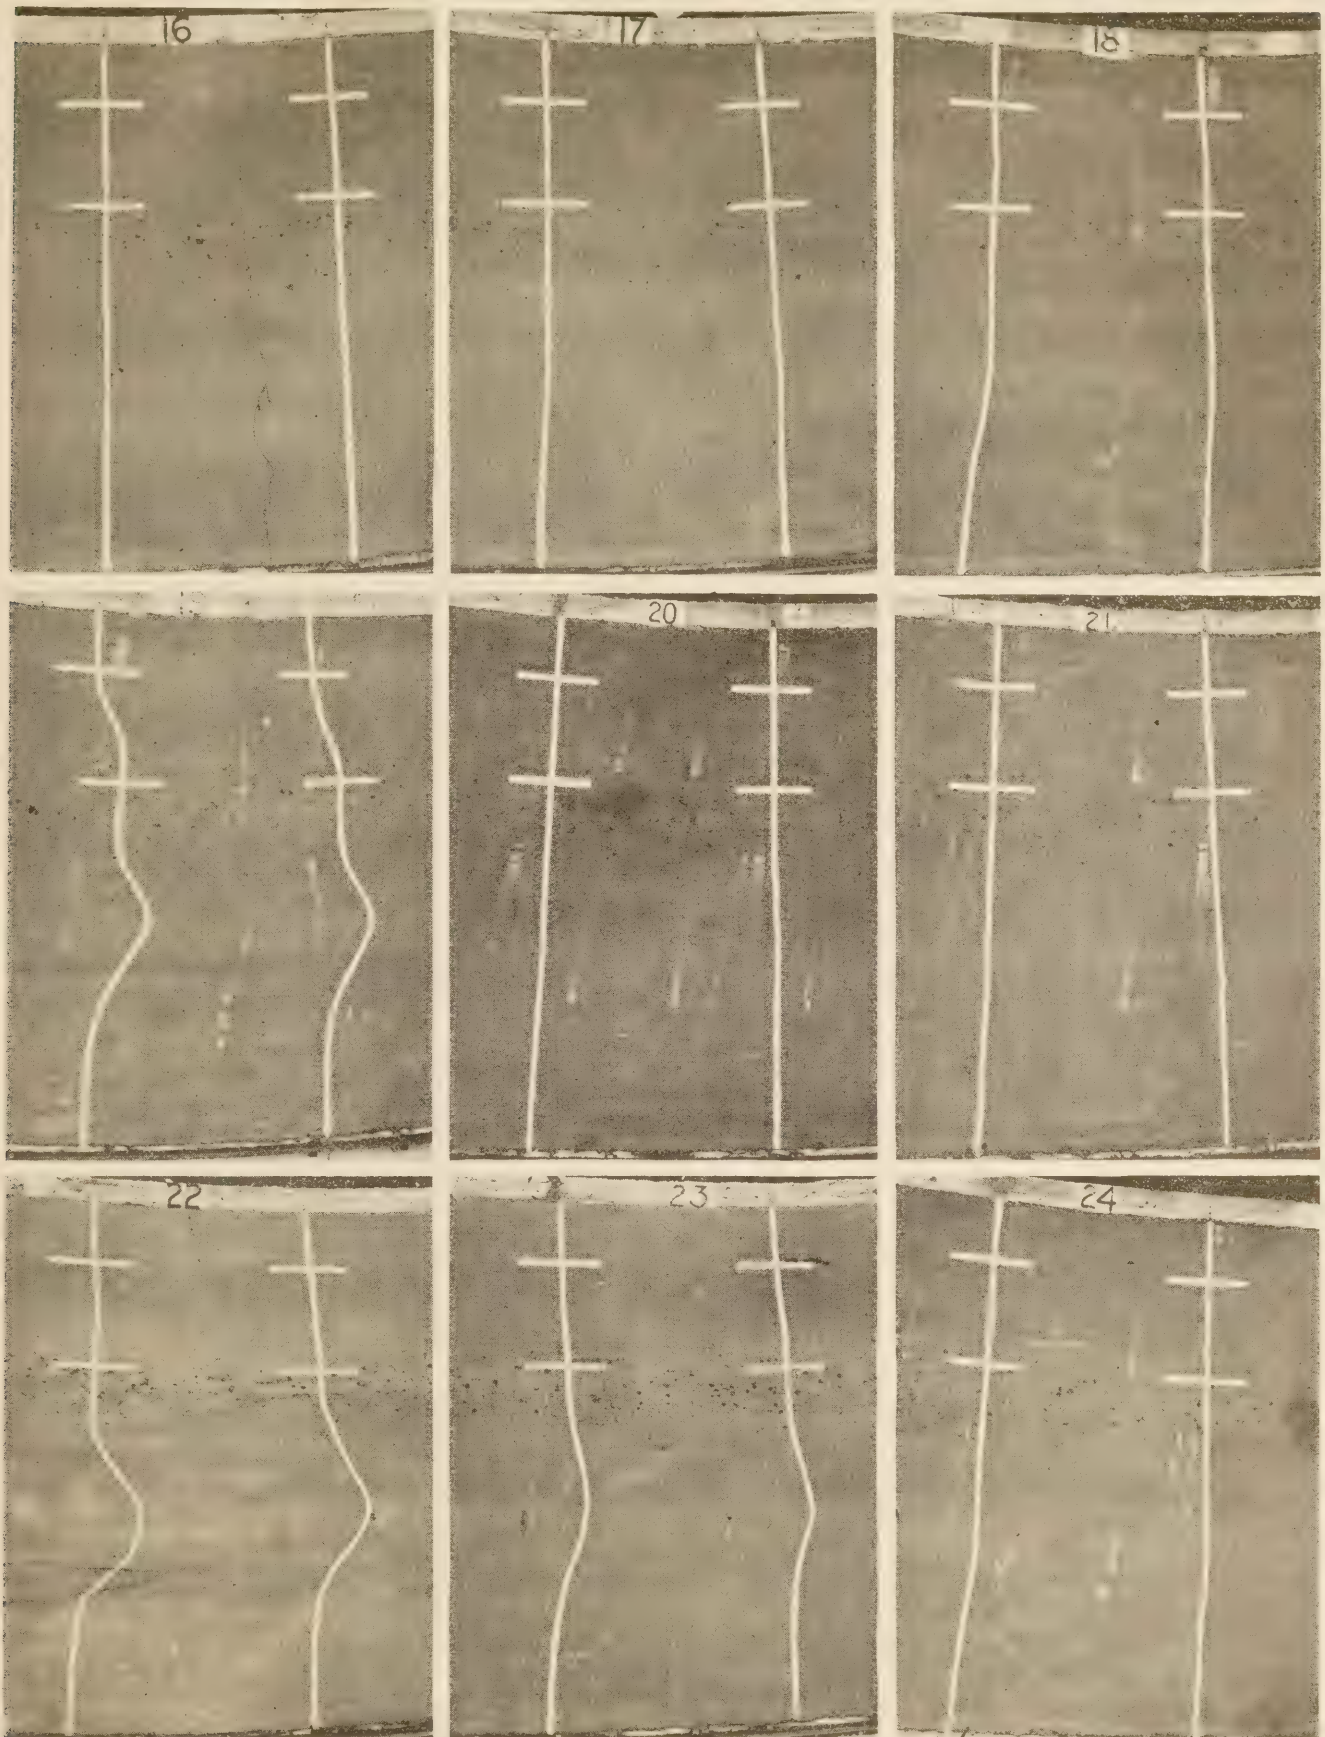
CONDITION OF TEST SECTIONS OF SECOND SERIES ON COMPLETION OF TESTS.
